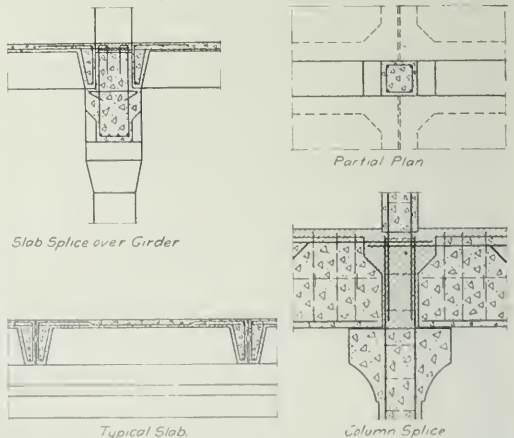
Details of "Unit-Built" Construction of Engine House at Riverbank, Cal.
